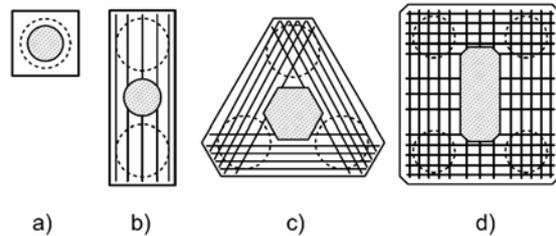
Primary tensile reinforcement in usual pile blocks
